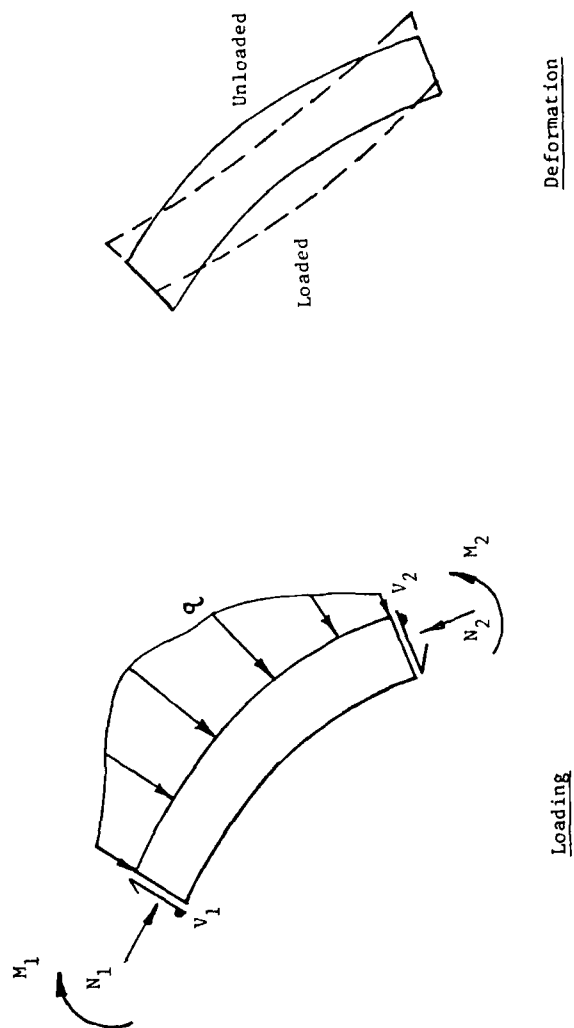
Behavior of circular tunnel wall under nonuniform external pressure
